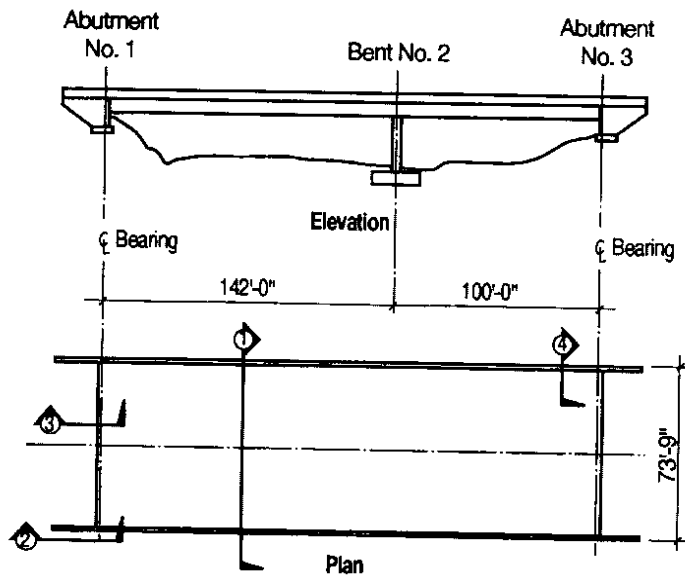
Plan and Elevation Views of Bridge (from Mast et al. 1996b).
